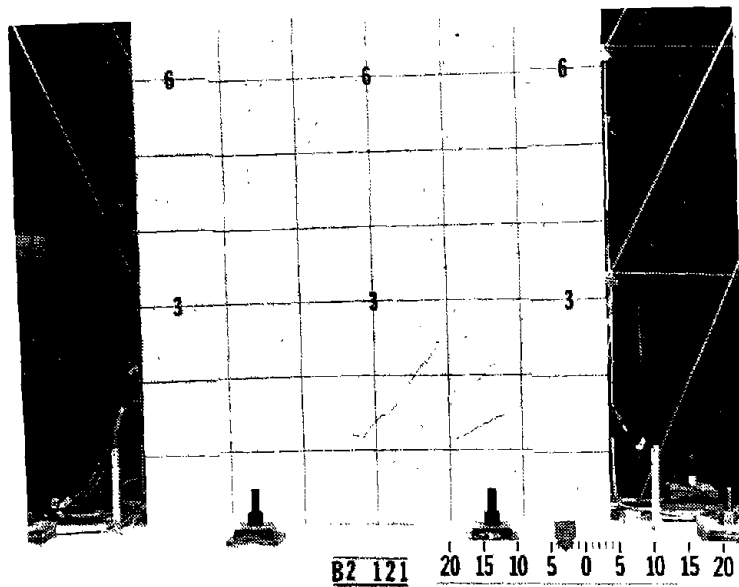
Cracking Pattern at -3 in. Deflection for Specimen B2
